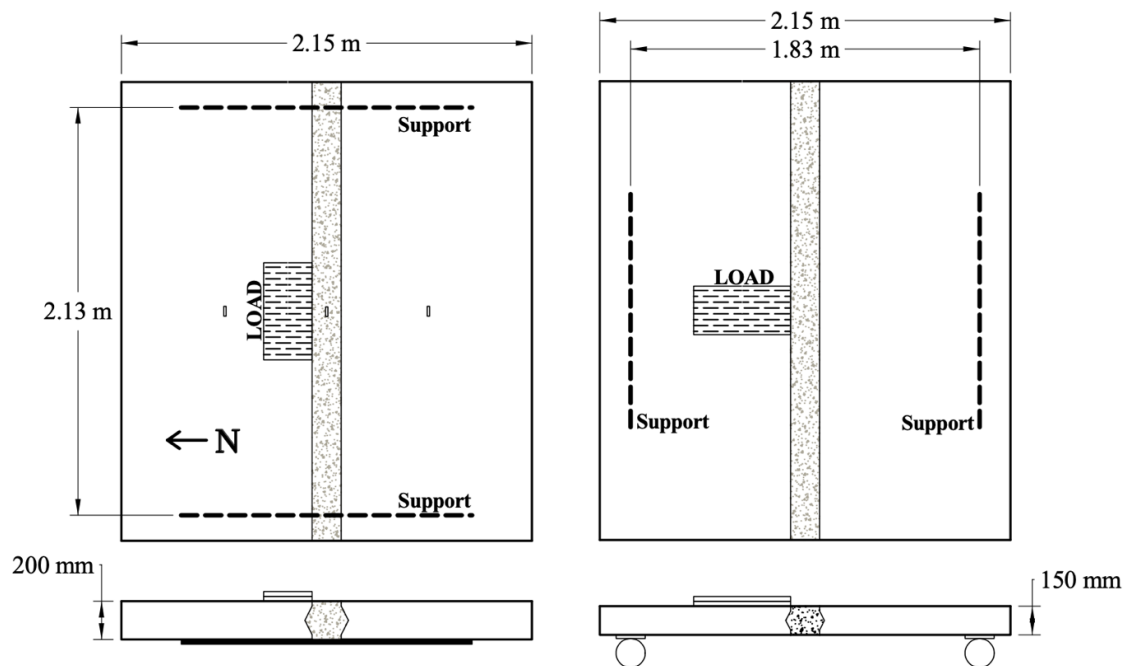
Cyclic loading test configuration for deck panels connected using UHPC joint [25].
